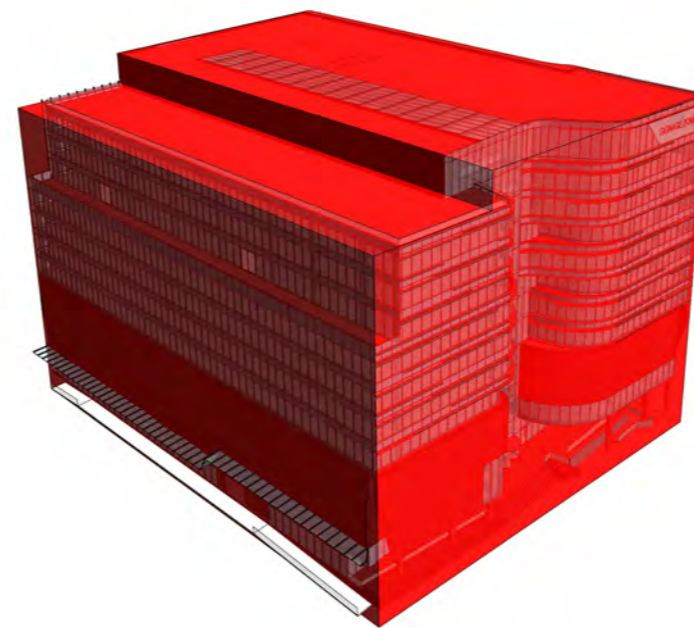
Parameter Plan envelope overlay. Aerial view at south east corner.
